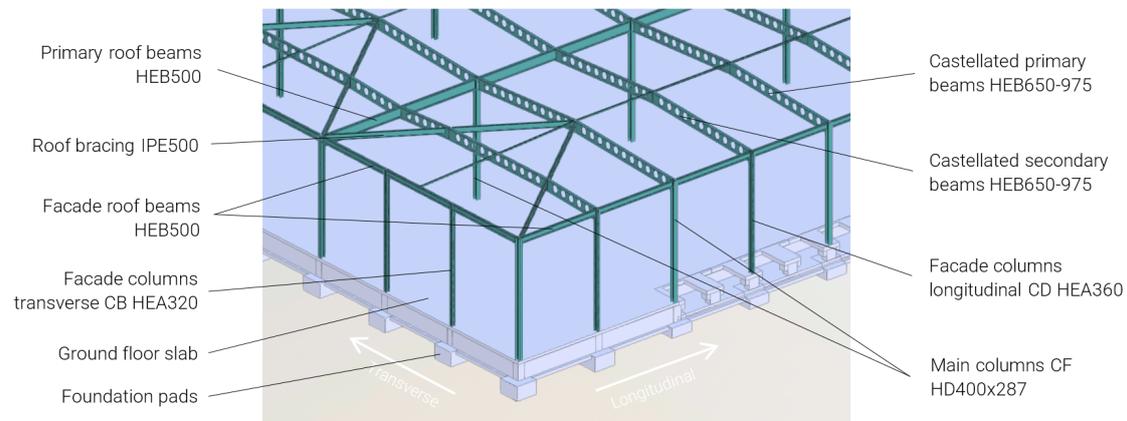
3D view of structural elements within the steel (SC16) warehouse frame (RHDHV Internal Document, 2022)
